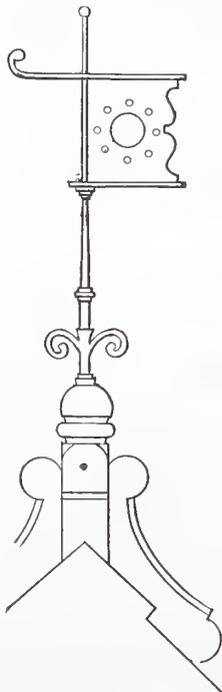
Elevation of Finial Surmounting Front Gable.—Scale, $\frac{1}{2}$ Inch to the Foot.
